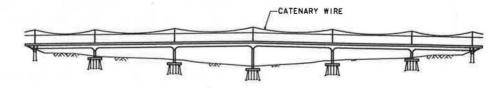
Metro Link cast-in-place concrete box girder bridge.
